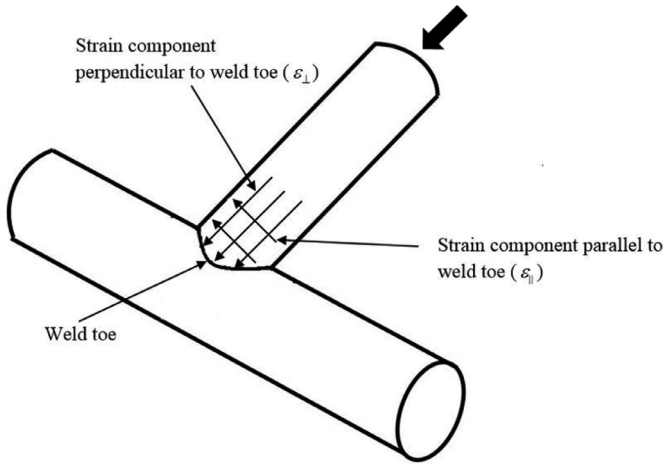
Parallel and perpendicular strain components to weld toe.
